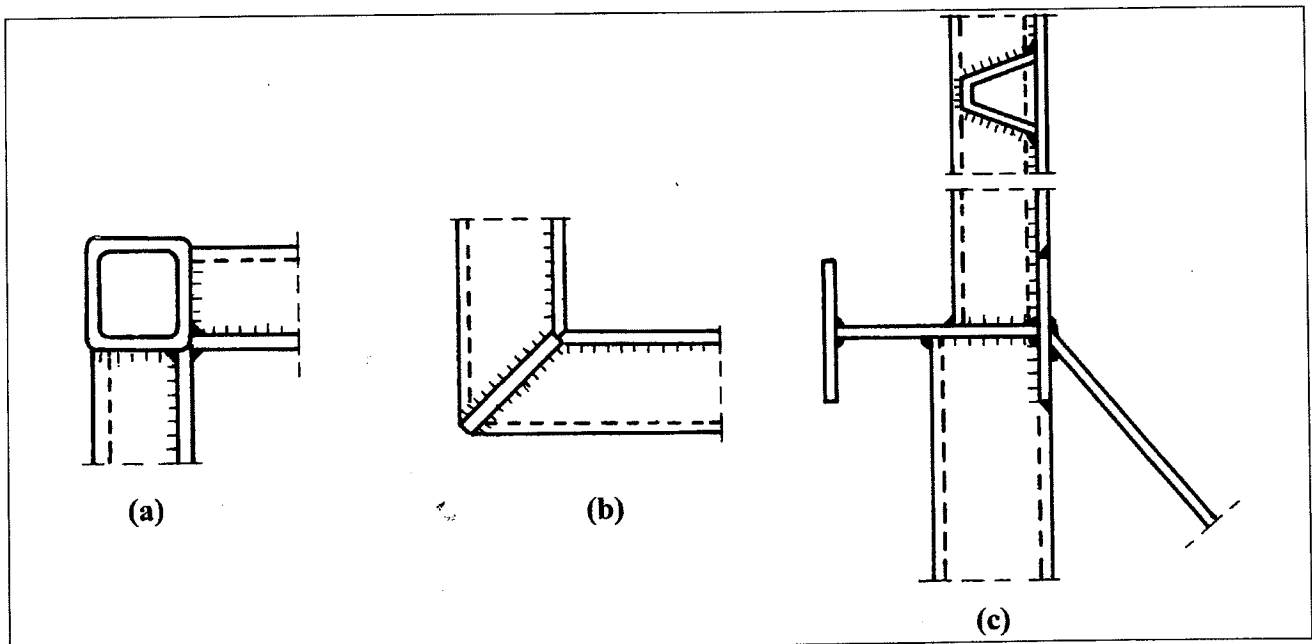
Welded connections in a bunker. (a) Connection of stiffened bin walls to vertical edge beam; (b) connection of stiffened hopper walls to edge plate strip; (c) connection of hopper base plate, vertical edge beam and column to transition welded I-beam.
